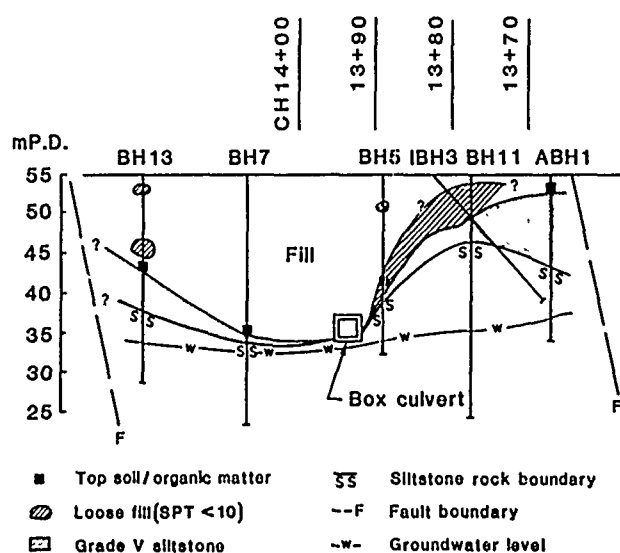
Cross section through trunk road showing the geological and groundwater conditions
